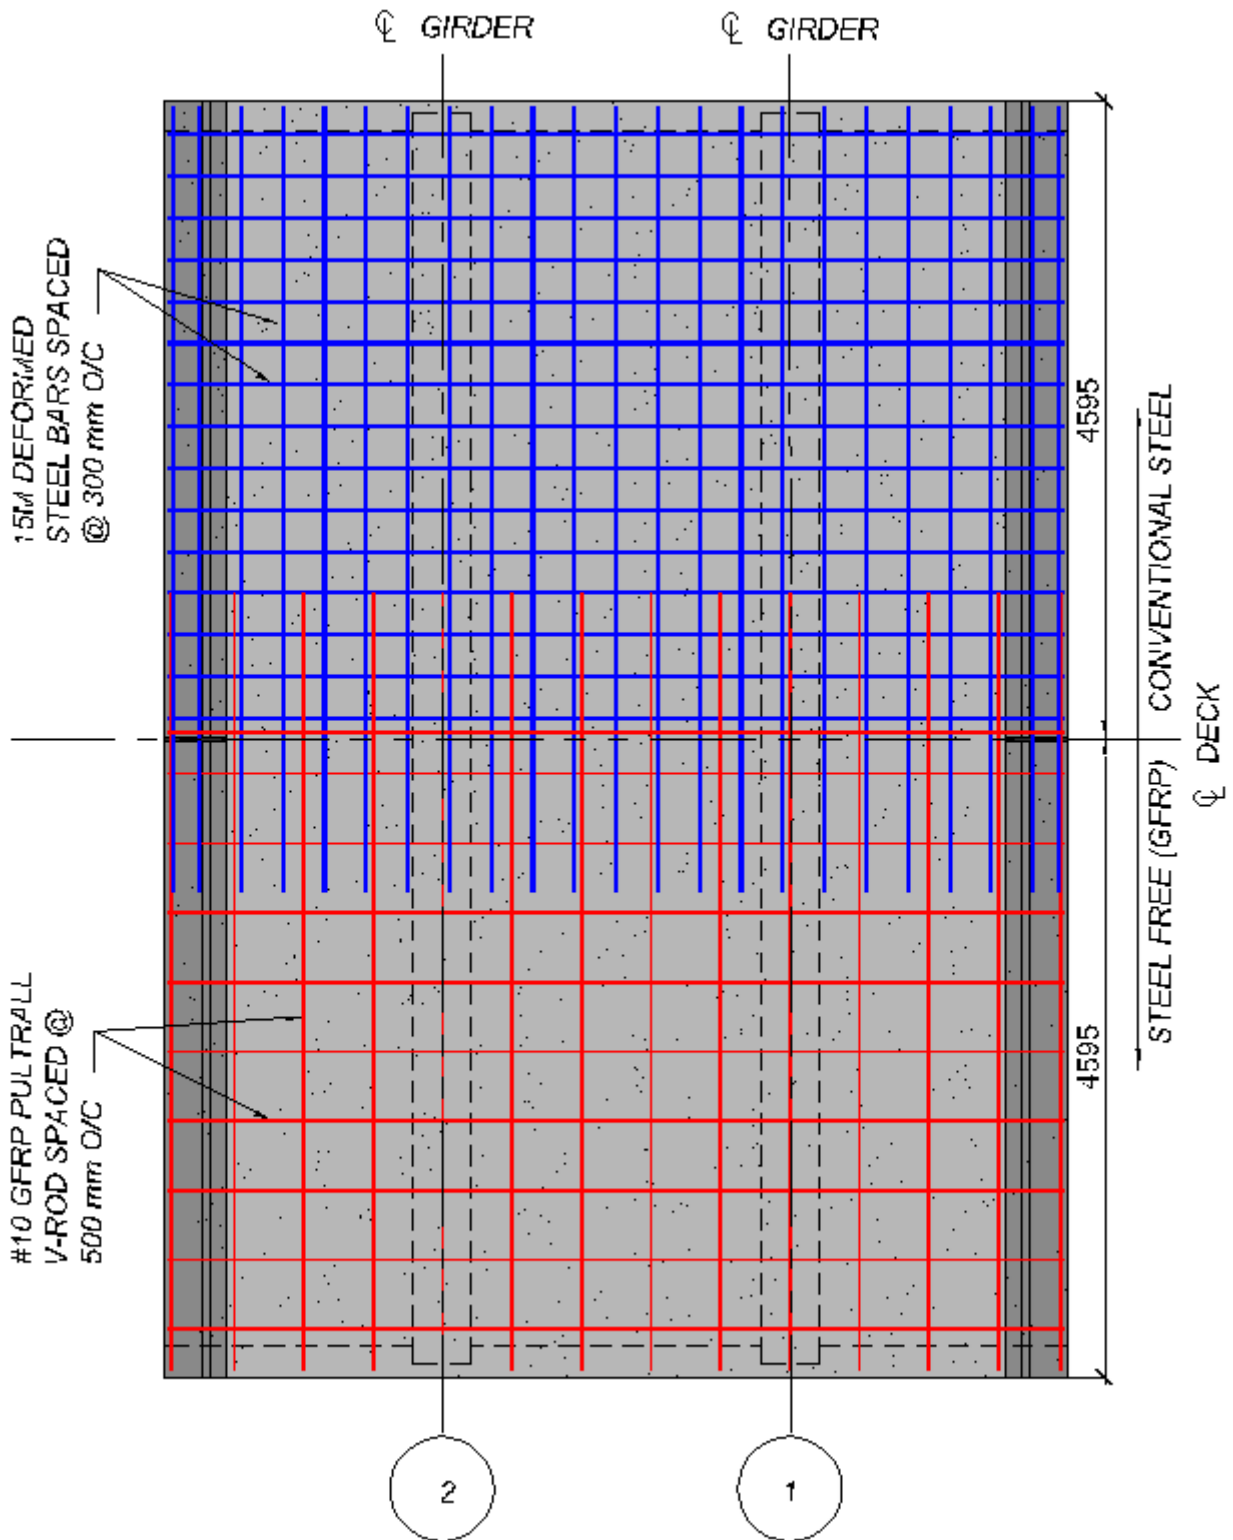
Plan view of concrete bridge deck slab with bottom internal reinforcement schematic used in this experiment
